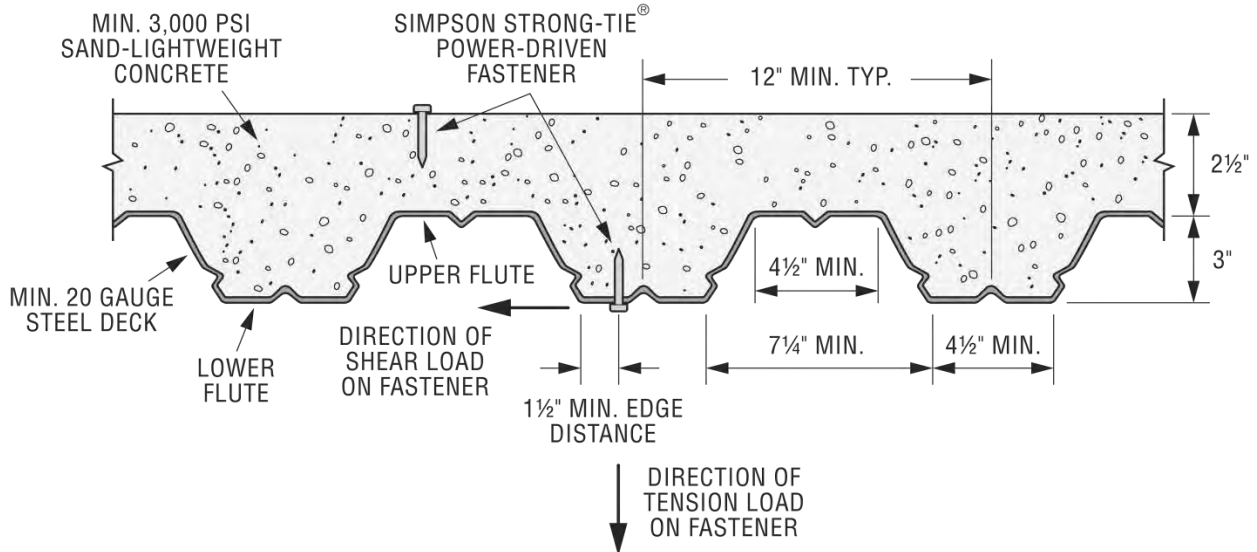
INSTALLATION IN 2 1/2-INCH CONCRETE FILL OVER 3-INCH-DEEP STEEL DECK
